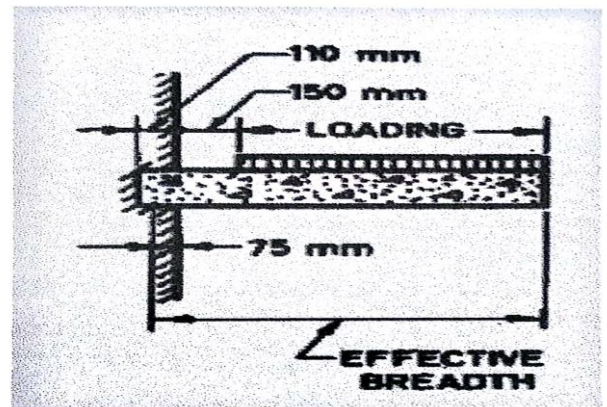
LOADING ON STAIR BUILT INTO WALL
